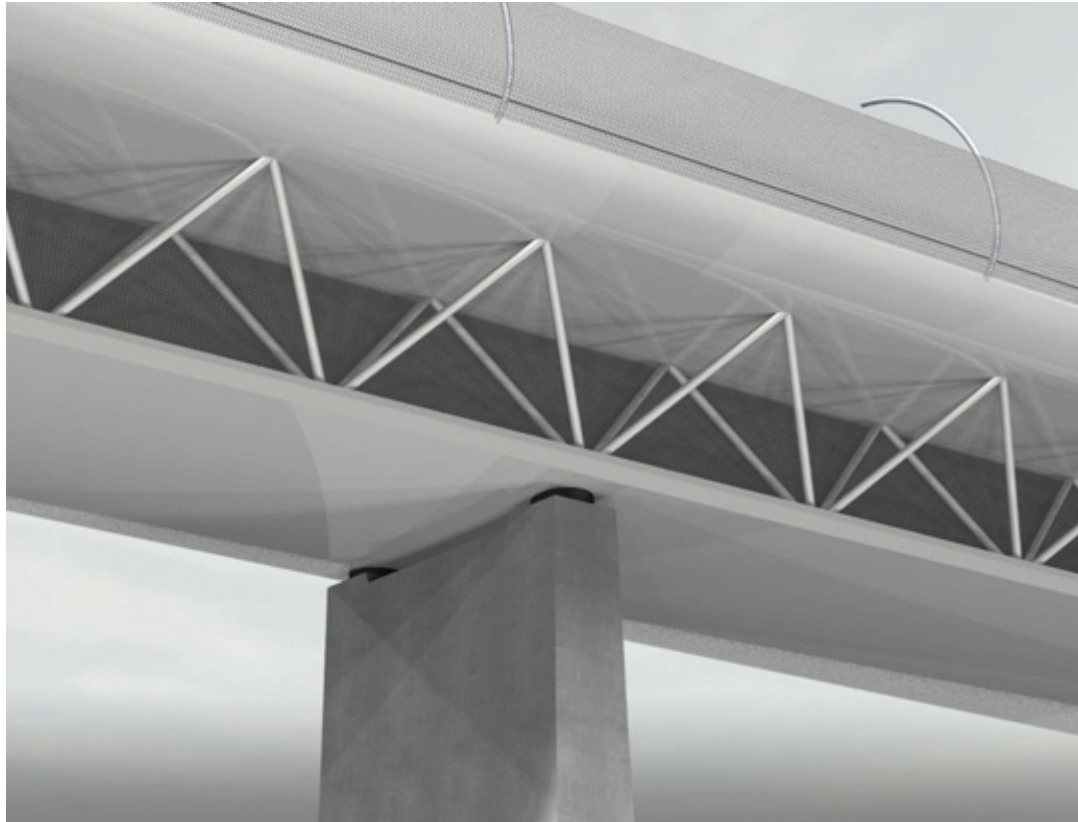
Double Level Approach Viaducts – Four Plane Warren Truss
